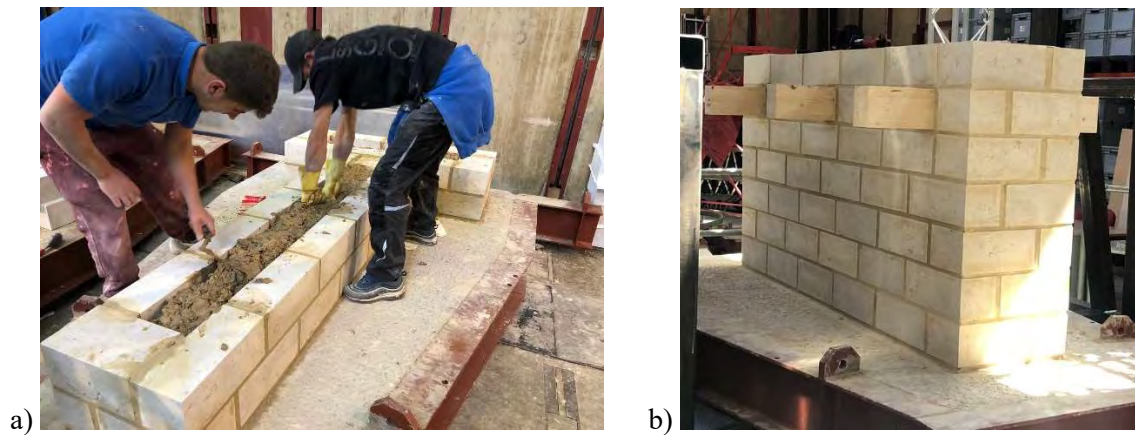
Working phases of wall construction: a) Addition of Filling Material between the outer leaves and b) completed rectangular wall
